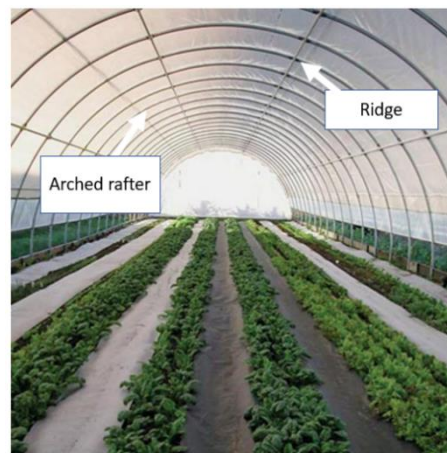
High Tunnel Greenhouse (adapted from FarmTek, 2021)
